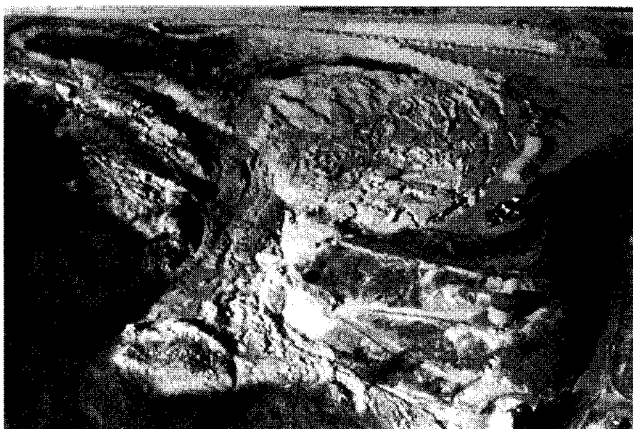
Aerial View of Tailings Dam Failure (Photo Courtesy of Yoshi Moriwaki, Woodward-Clyde Consultants)
